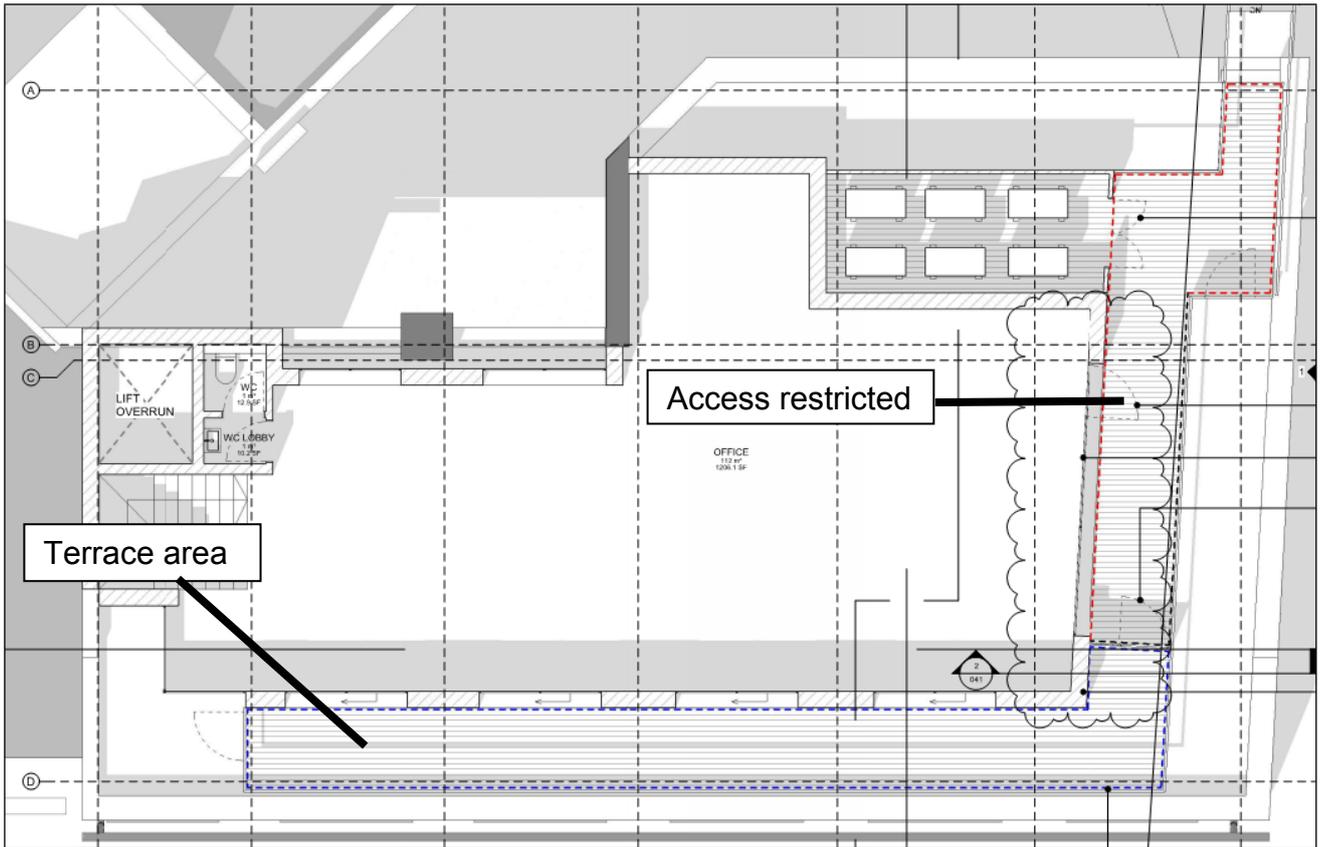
Section of flat roof area to be used as a terrace (dashed in blue)
